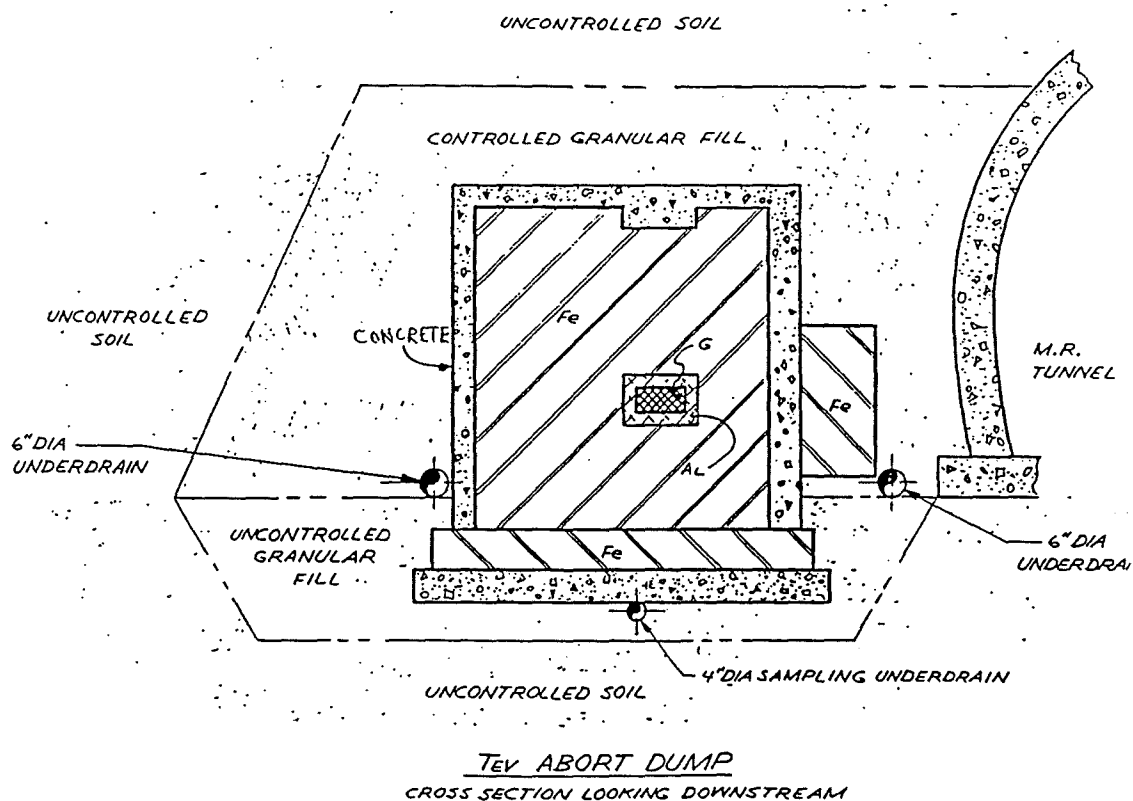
Cross Section of Tevatron Abort Dump
